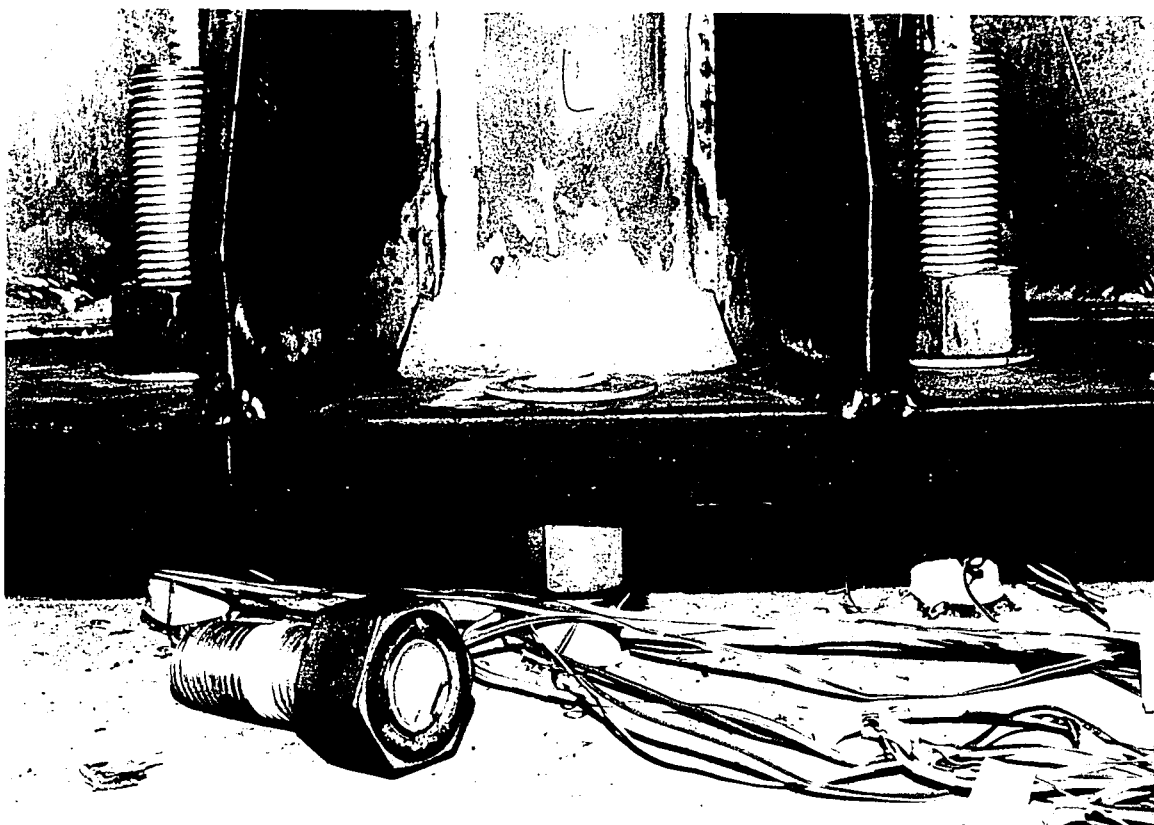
Closeup Photograph of Failure Location at Anchor Bolt
